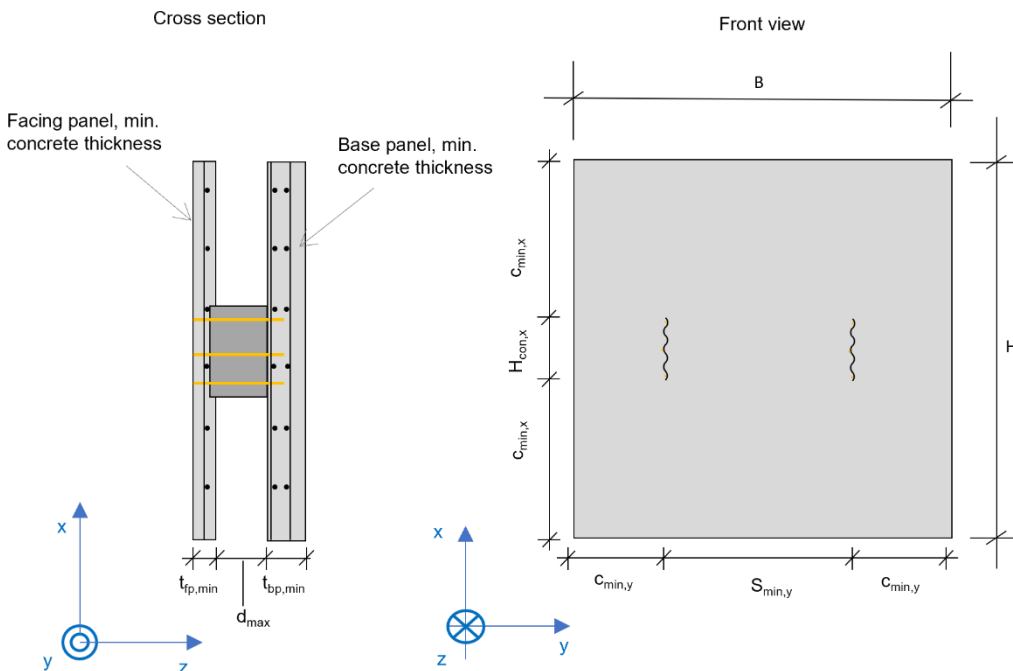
Test specimen for static shear test in the x-direction for determination of the minimum displacement module
